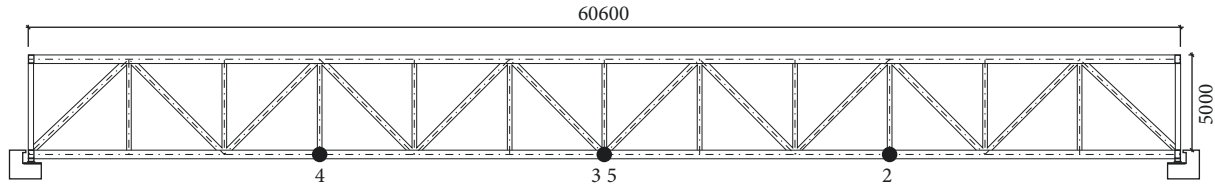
60 m aerial corridor structure vibration test point layout (front view).
